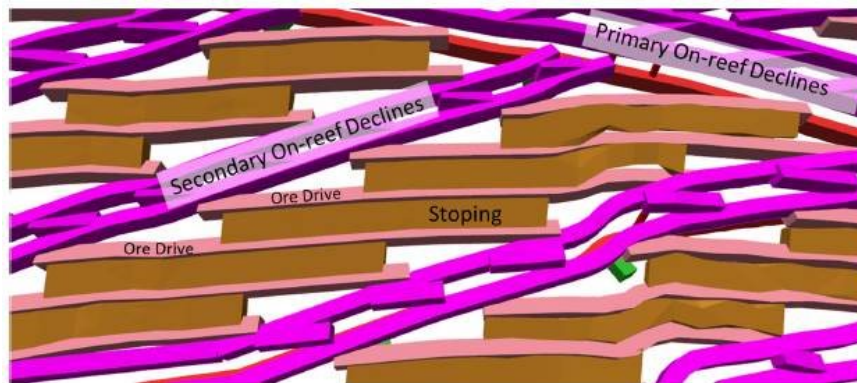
Typical Layout of BLR Mining Method (not to scale)
